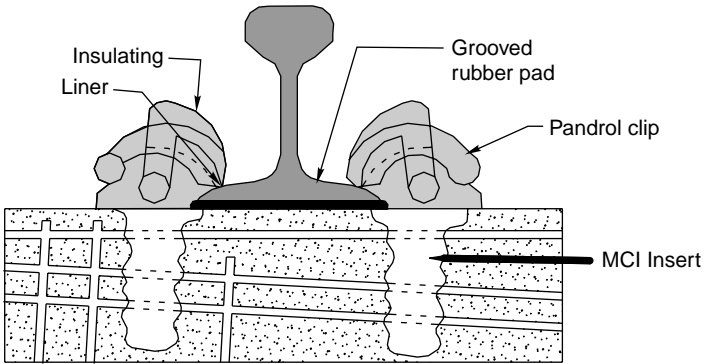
Details at rail seat of a prestressed concrete sleeper
